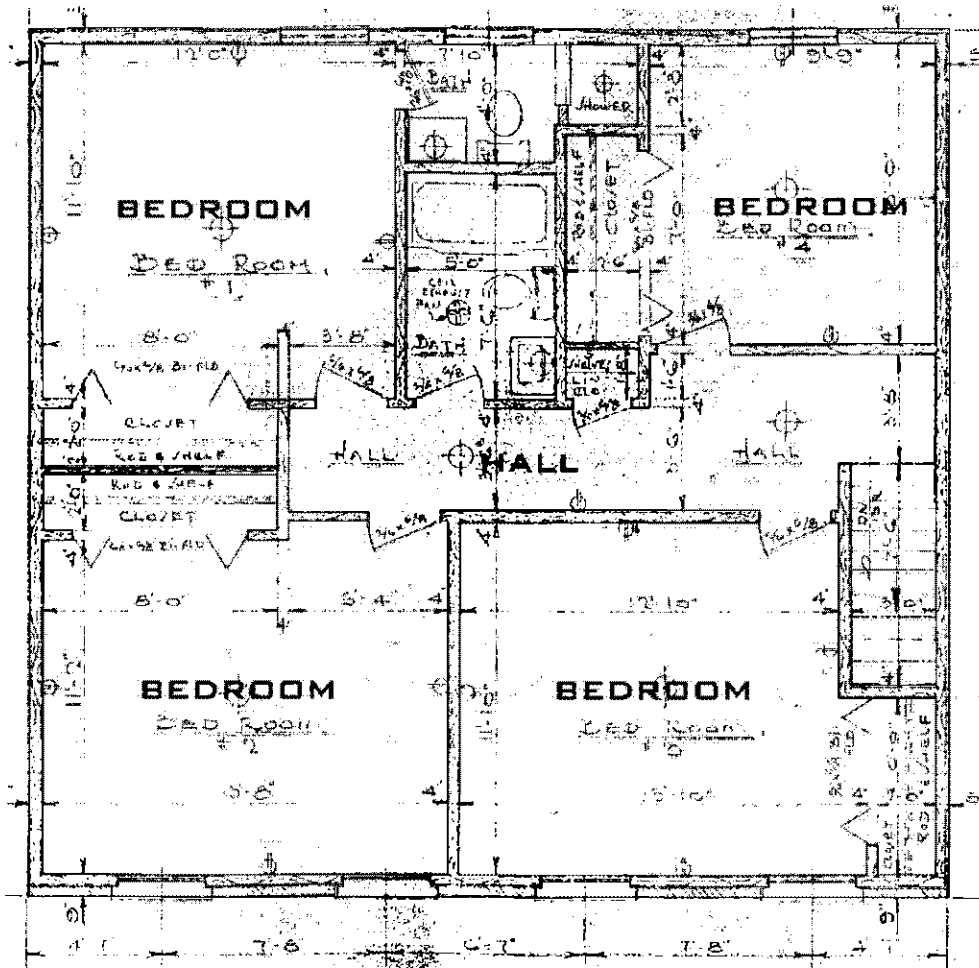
First-floor plan, 320 Scott Avenue, 1969 traced over in 2004. Author's collection. As constructed, the house was flipped with the stair on the left. The bathroom with the tub was also moved across the hall in between the front bedrooms (bottom of image), creating a large alcove in the master bedroom.
